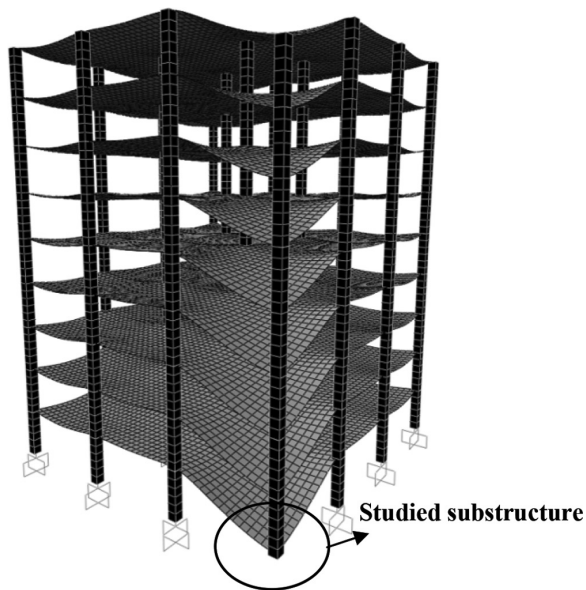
Deformation shape of prototype flat plate after one of the corner columns was lost (drawing not to scale).
